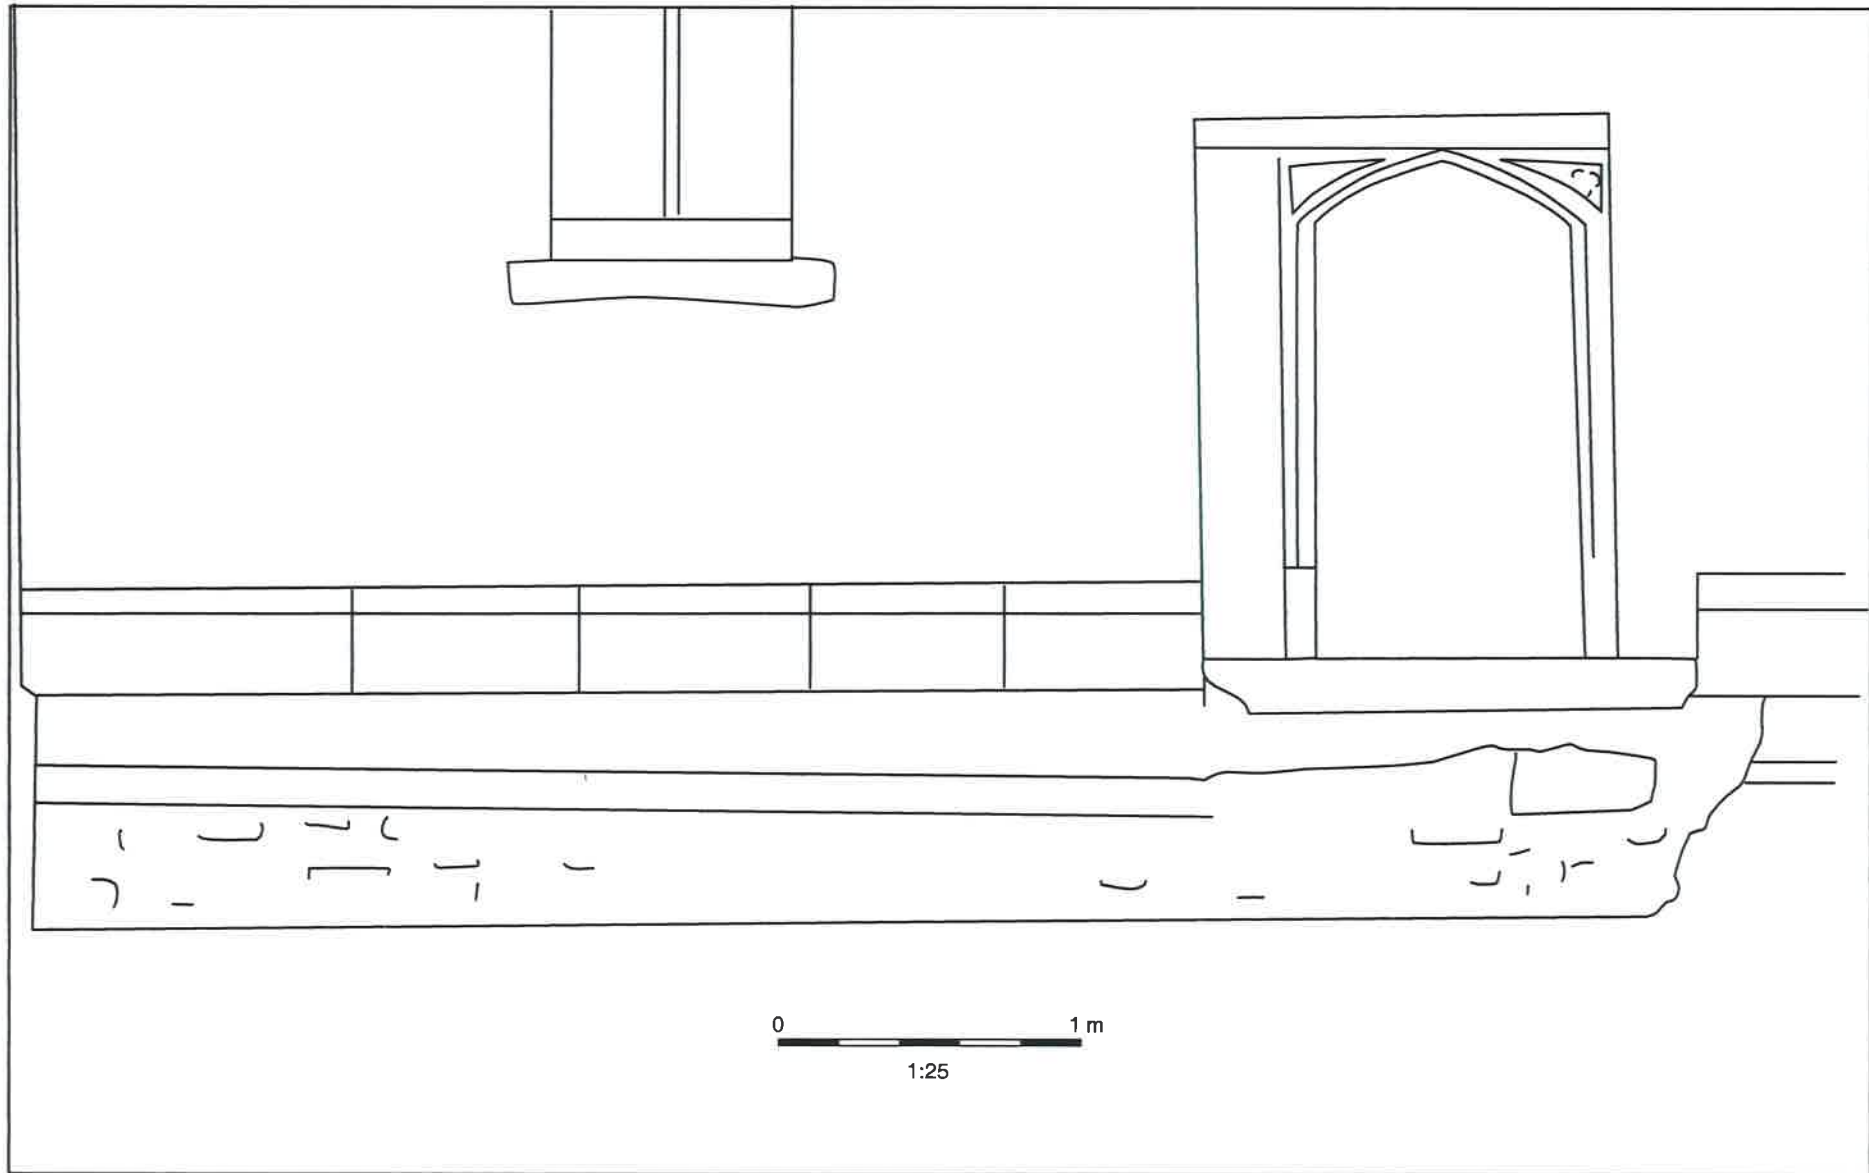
Saint Laurence's Church, West Challow. Elevation of South Wall
